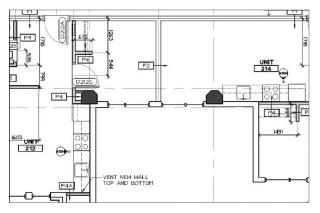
Floor Plan Units 212 and 214 Showing Test Wall
